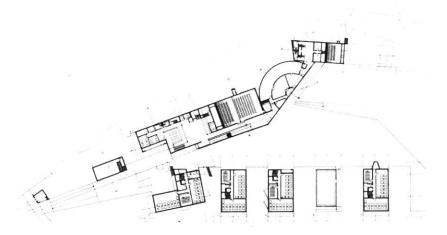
School of Architecture plan. Tower H is on the right lower corner [orientation: 8° east of north]
